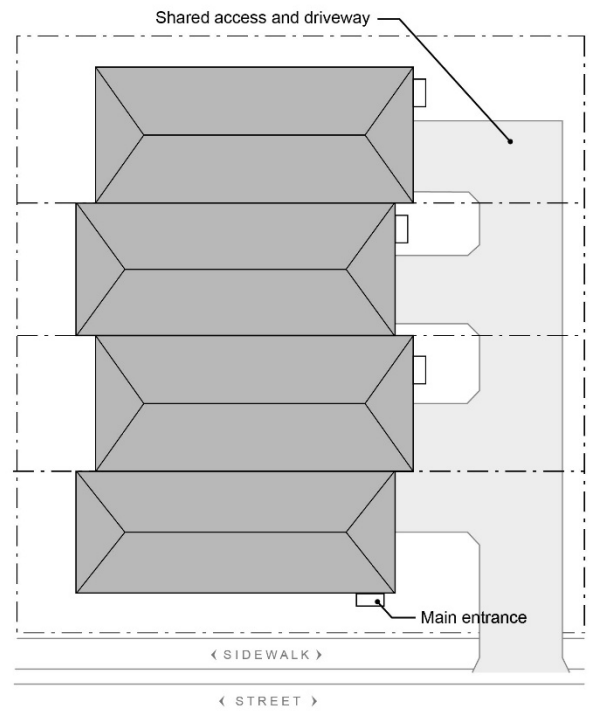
d. Townhouses with Access from Shared Driveway and Access Easement/Tract
